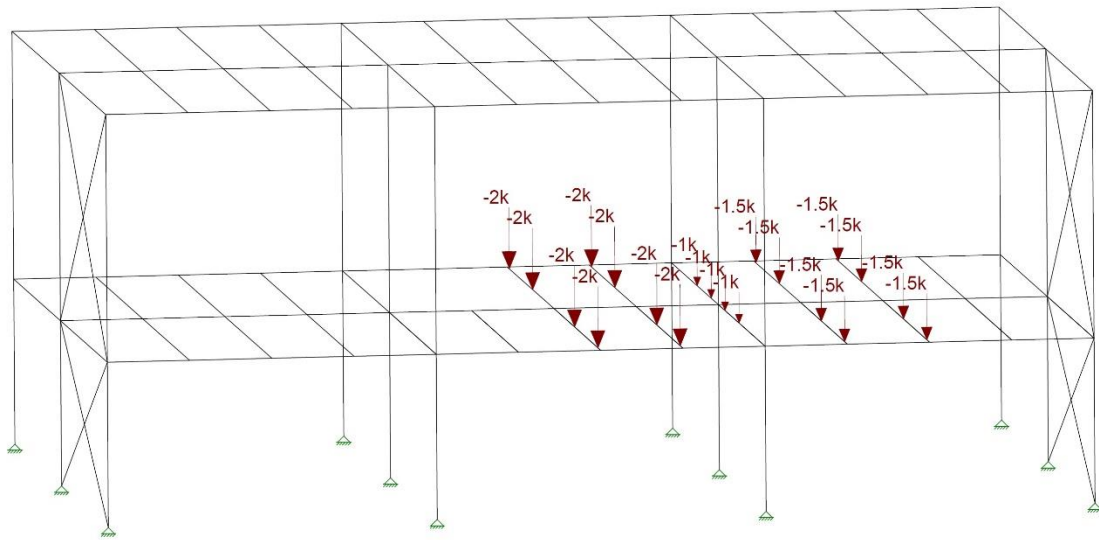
Applied mechanical equipment loads on building frames in RISA-3D
